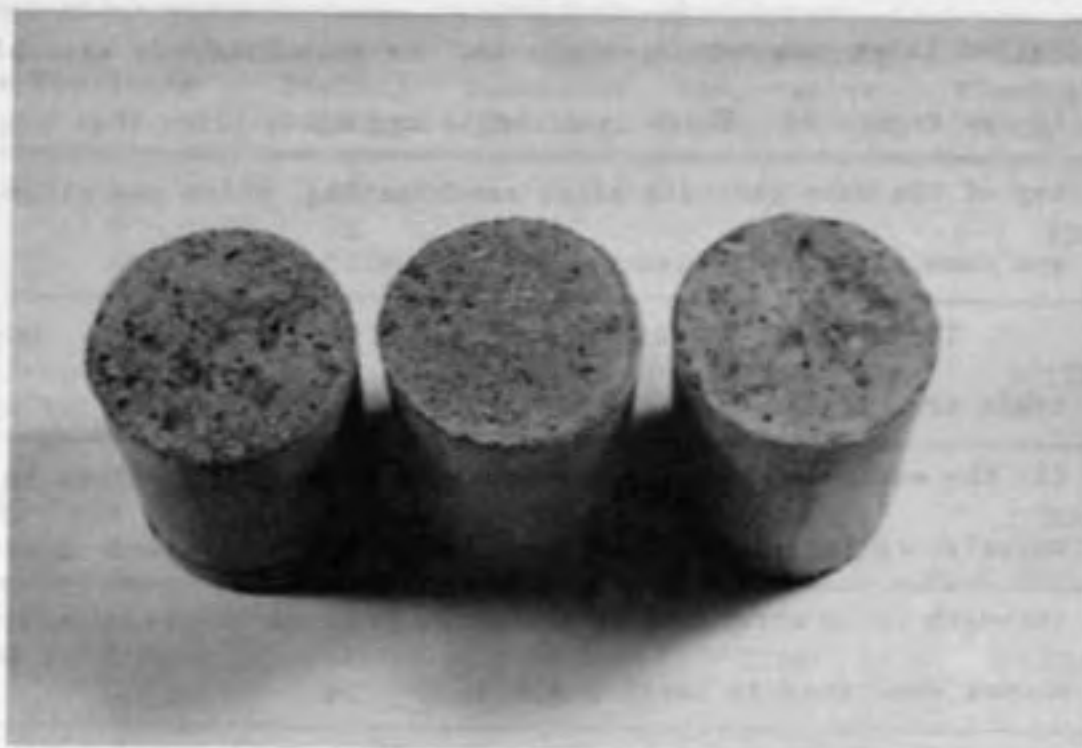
Failure Surface of Typical Latex Concrete Specimens
